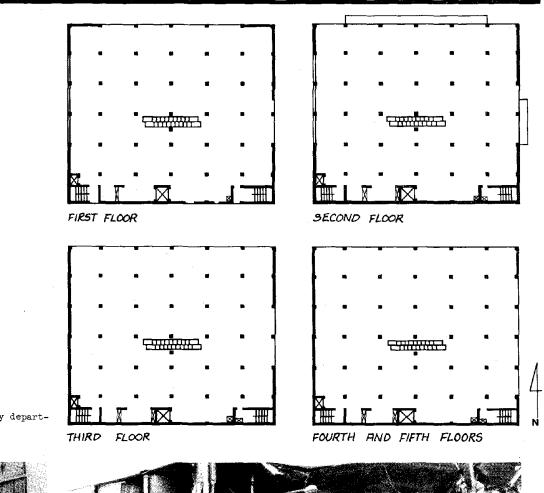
Plans of J.C. Penney department store, damaged in the 1964 Anchorage Alaska earthquake.
